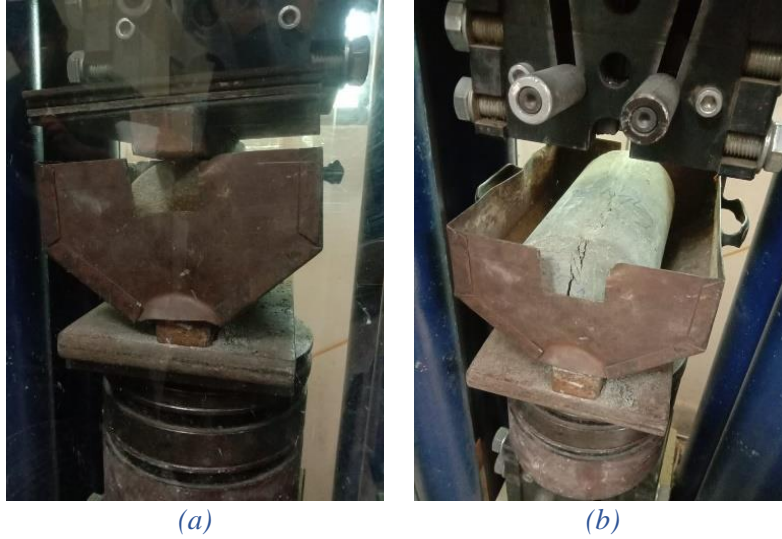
Split Tensile Test Being Performed on Samples (a) before failure (b) after failure
